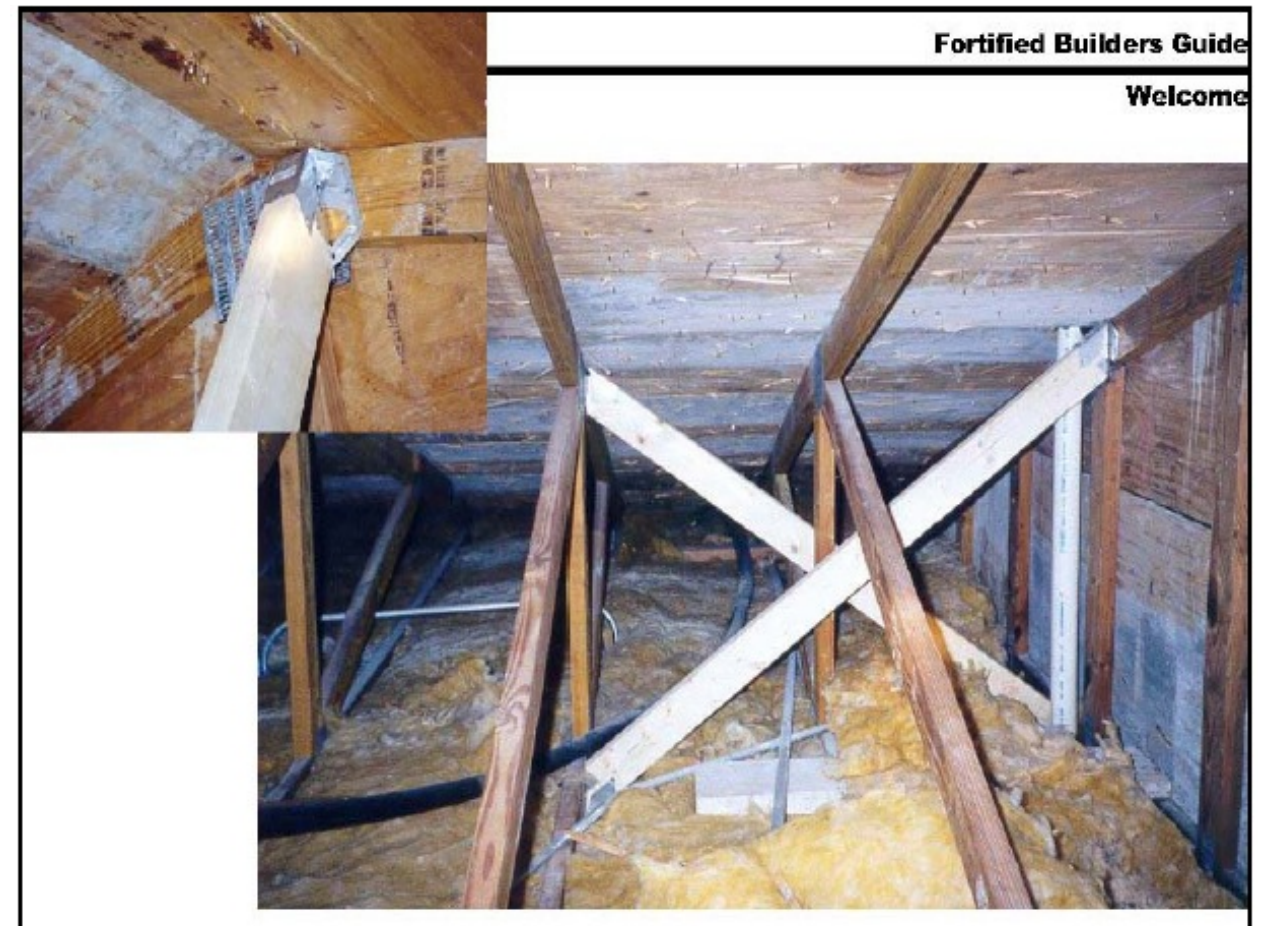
Gable End Wall Cross Bracing. Cross Bracing should connect to truss as close to the sheathing as possible. In this case, a special metal connector was used to make installation easier in existing attic. Top and bottom chord bracing not shown. (Institute for Catastrophic Loss Reduction, 2009).
